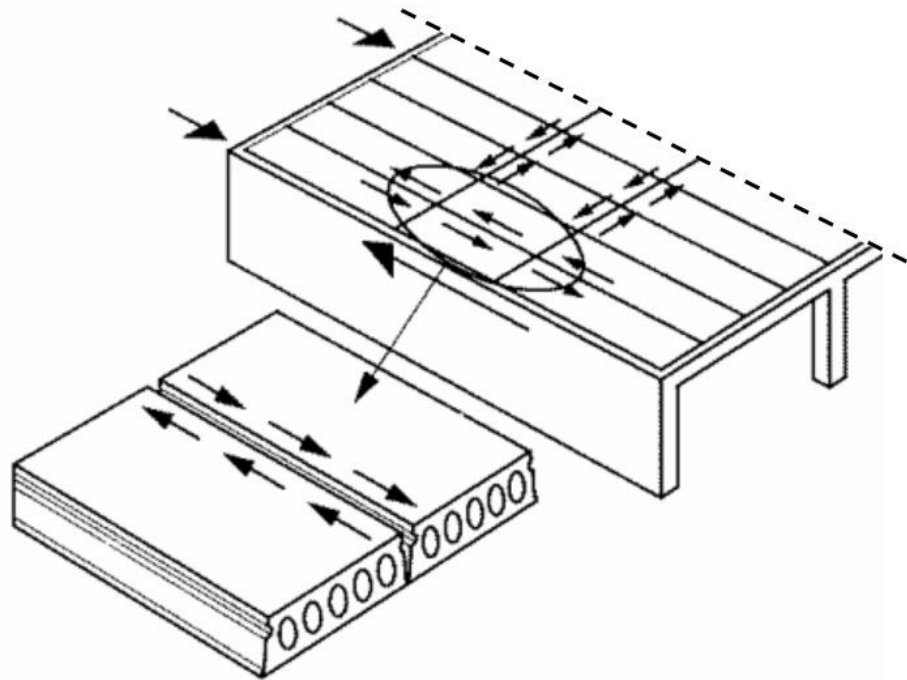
Horizontal load transfer from floors to shear walls, in longitudinal joints [2]
